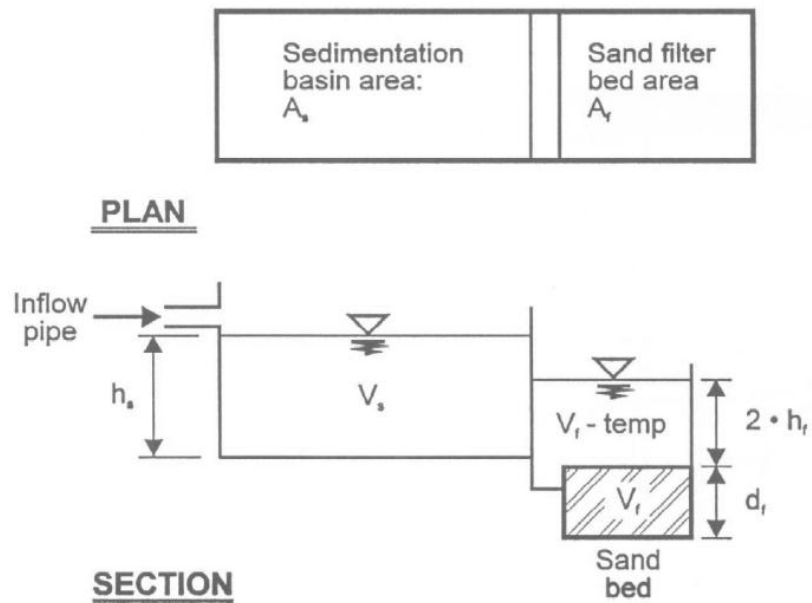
4 Surface Sand Filter (cross sectional view)
